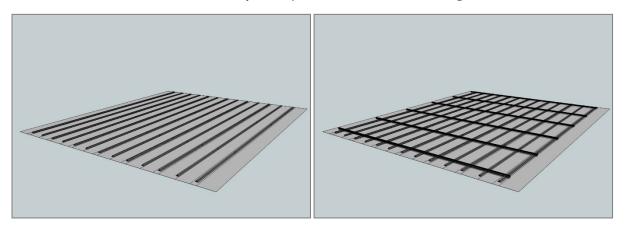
The RENOLIT ALKORPLAN Solar concept: extended and interconnected profiles. Short stand-alone pieces are not allowed.
